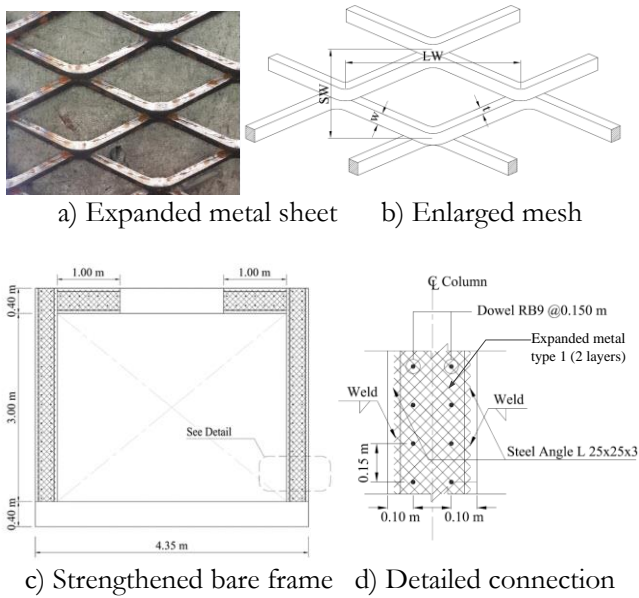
Expanded metal mesh and detailed connection for the bare frame.
